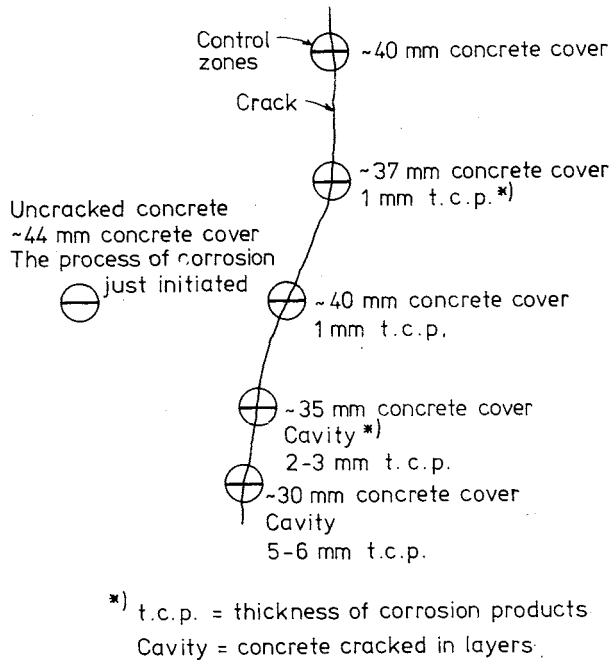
Position of reinforcement. Concrete cover and degree of corrosion in the crack shown in Photo 5.
